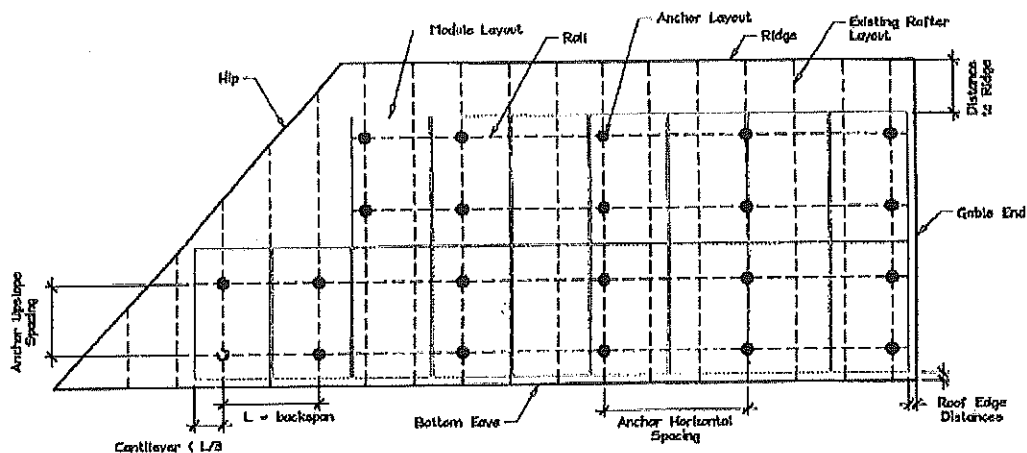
Sample Solar Panel Array and Anchor Layout Diagram (Roof Plan).
